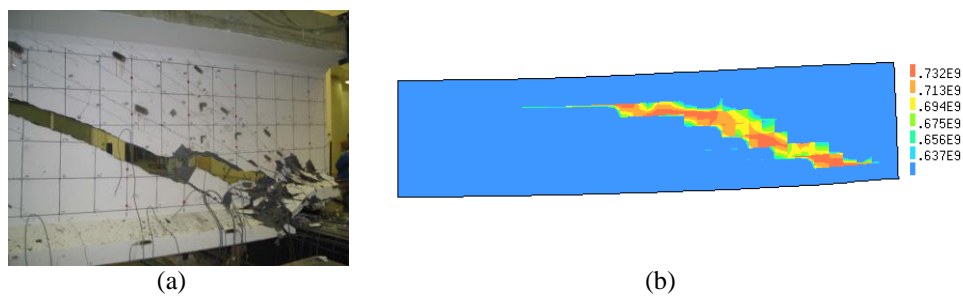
Diagonal tension failure of girder G5E: (a) East half of girder G5 at failure [95]; (b) F-CMM analysis - deformed shape (x10) with the vertical reinforcement stress contour levels at peak load (values in Pa and between f_{sy} and f_{su}).
